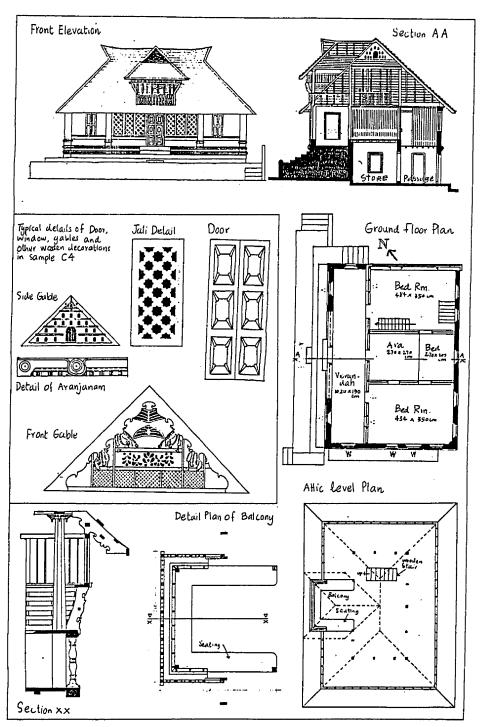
Elevation, section, plans and details of balcony, gable, jali and door shutter of sample C4 (After: Kerala State Nirmithi Kendra, Documentation of traditional houses in Kerala, 1993).
